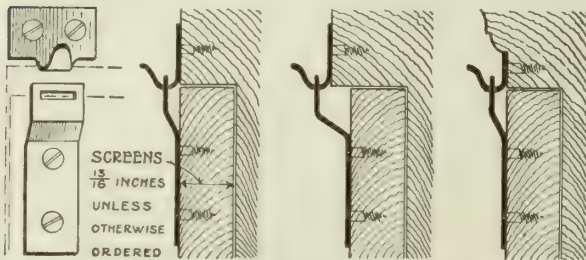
DETAILS SHOWING APPLICATION OF BURROWES SCREENS
